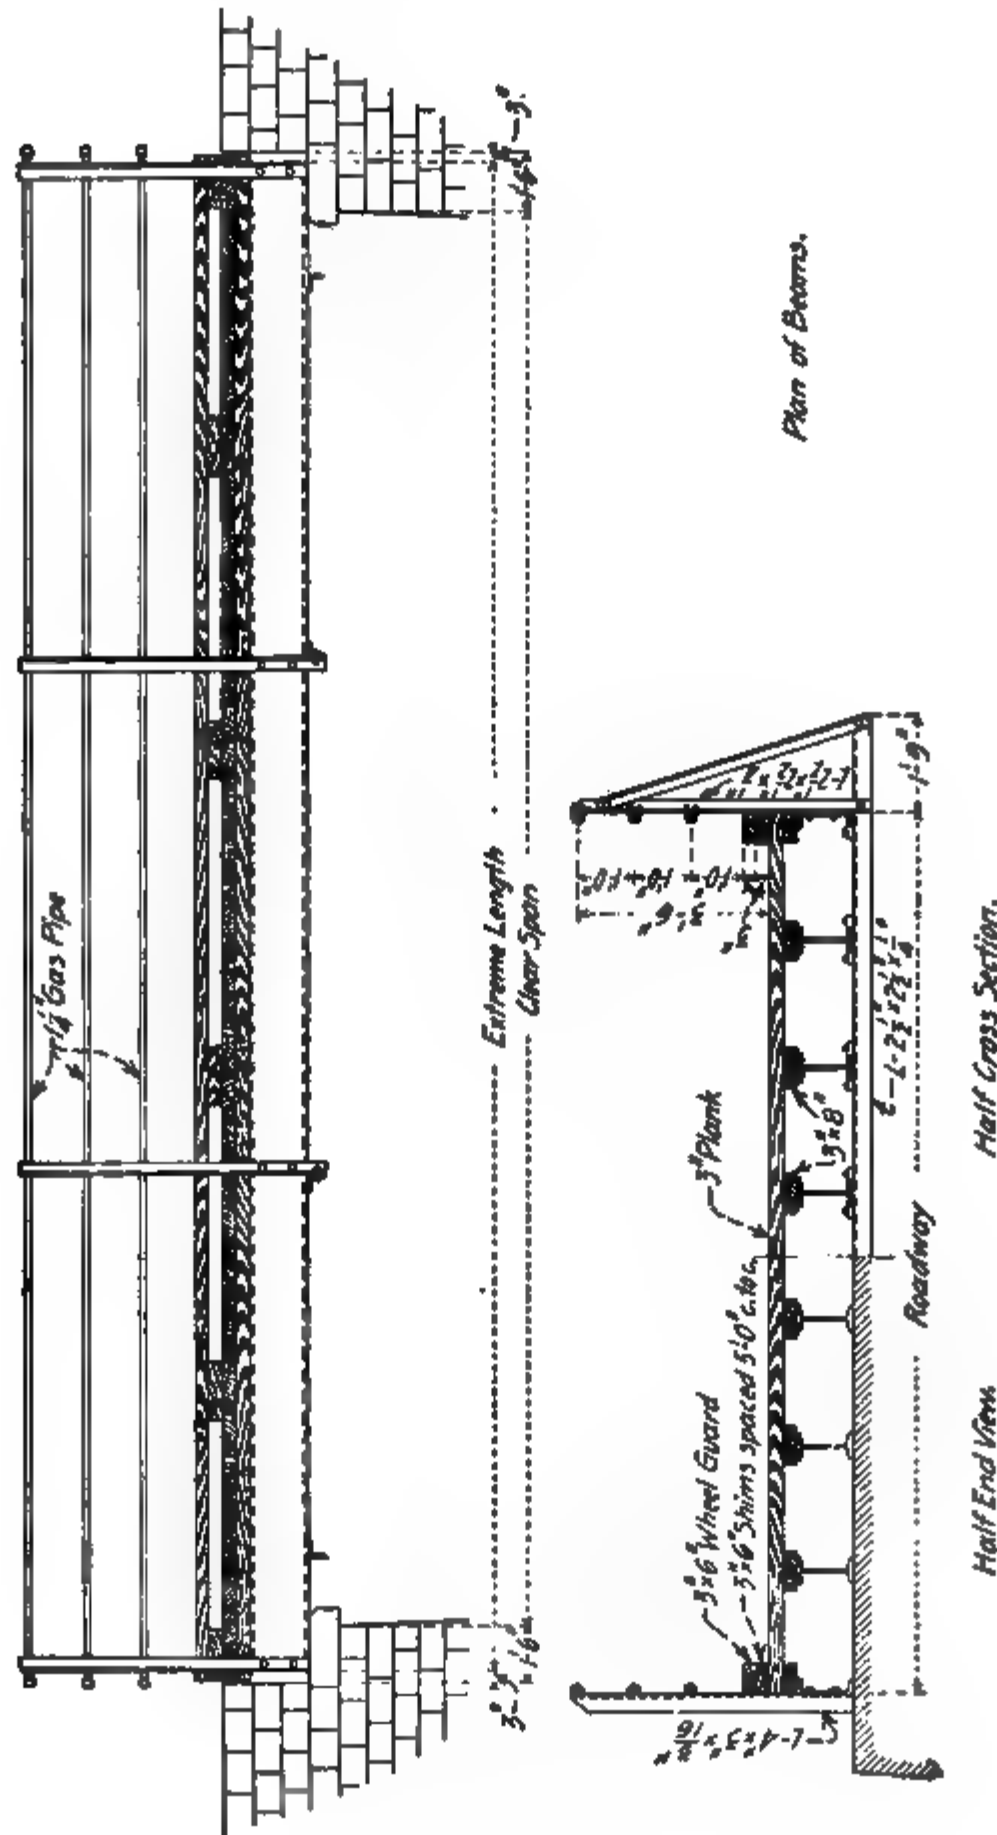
BEAM BRIDGE. (AMERICAN BRIDGE COMPANY.)
